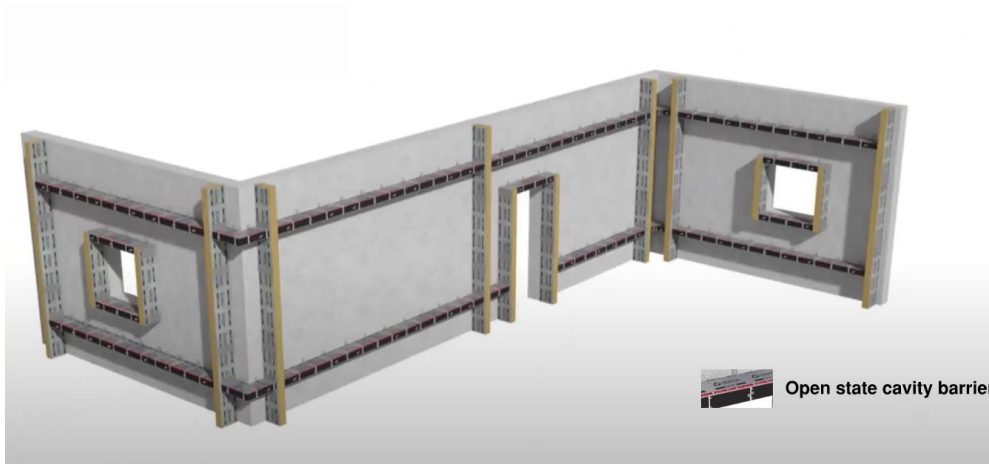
Open state cavity barrier installing locations for an external wall (Siderise website)
